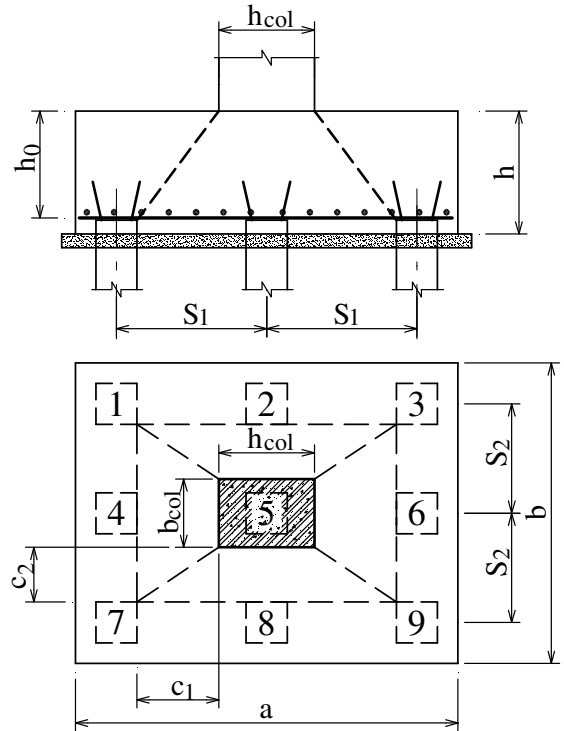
Punching behavior of an example pile cap, showing the development of the punching failure zone beneath a reinforced concrete column.
